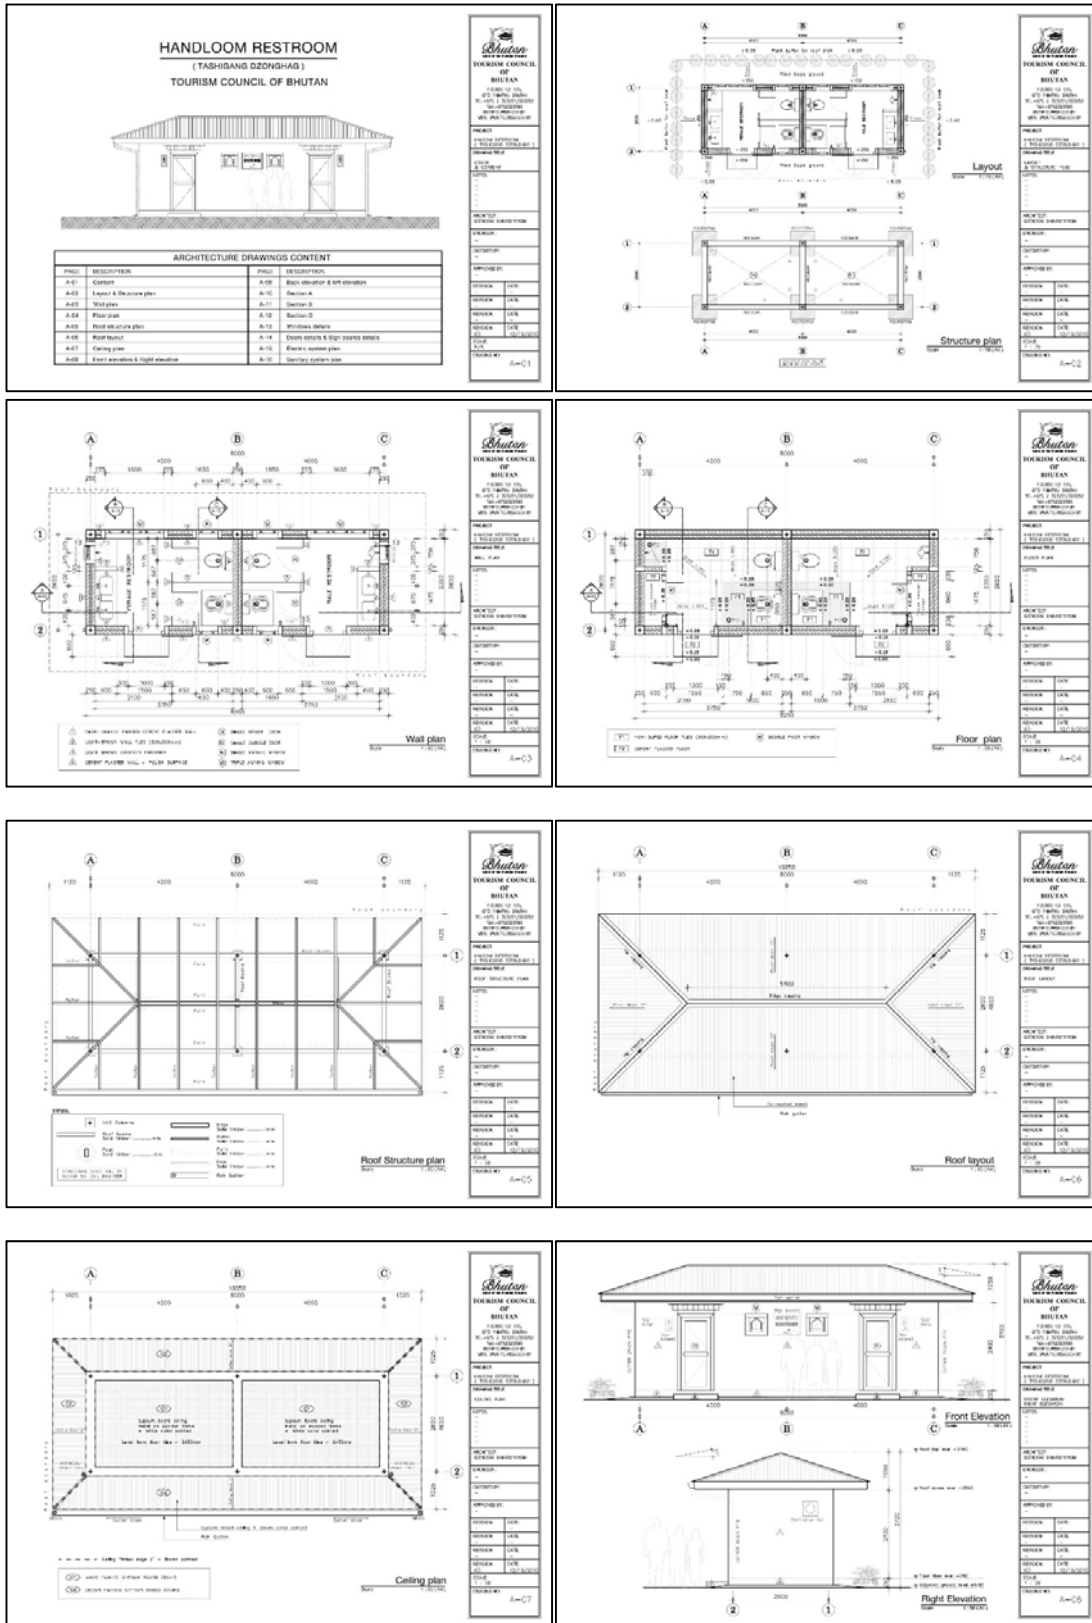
Construction drawings of Handloom center restrooms
